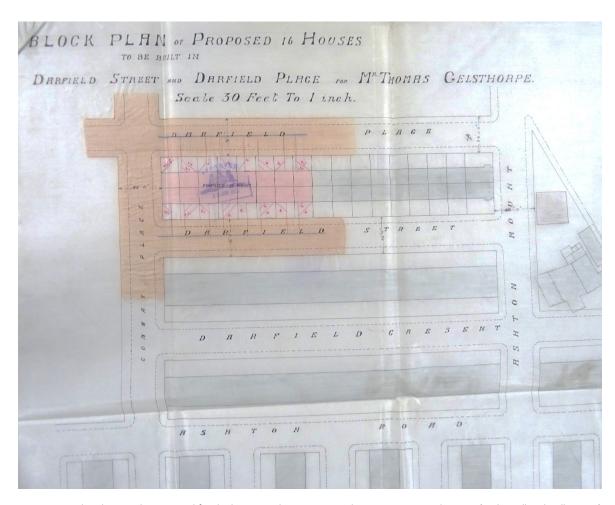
Site plan showing that approval for the houses in the street was split into separate applications (Carby Hall and Dalby 1903). The Ashtons and Darfield Crescent had already been built.
